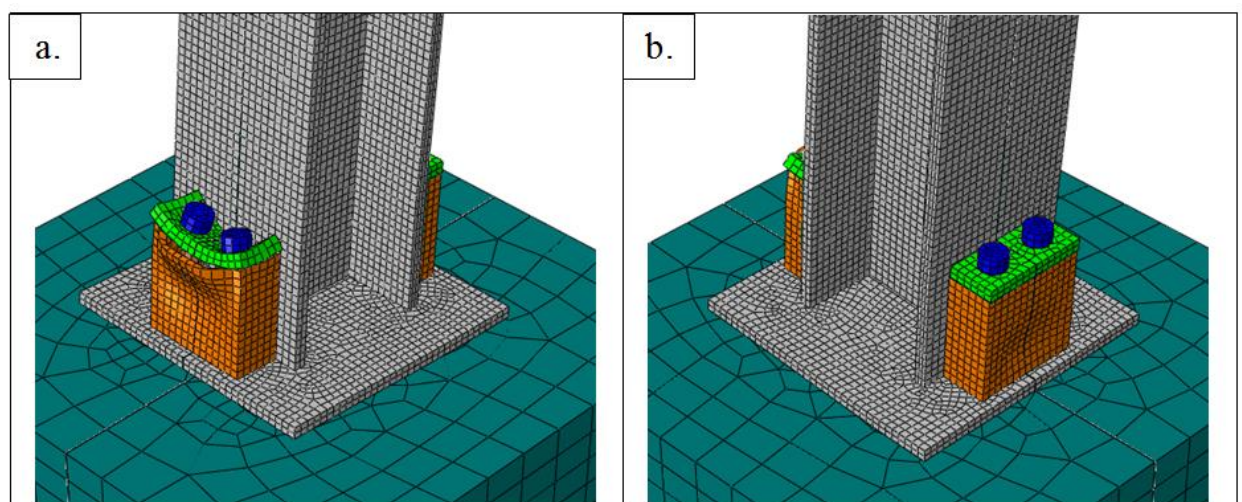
Deformation of model 4. a) Tensile flange, b) Compressive flange
